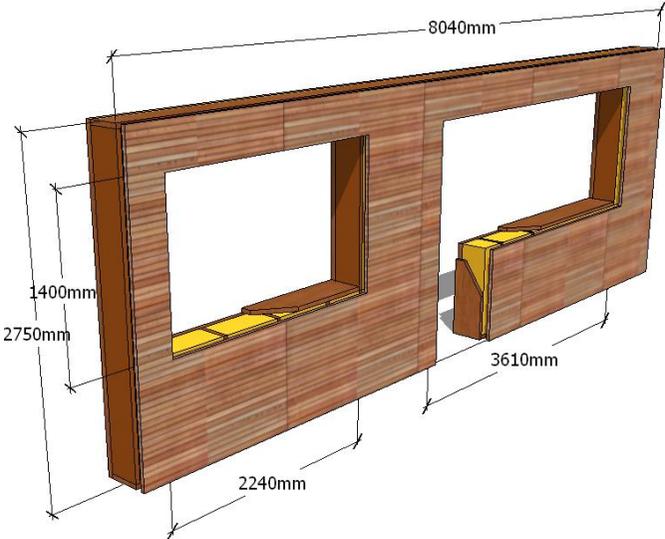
South-West facades prefab element, construction: wood + insulation
